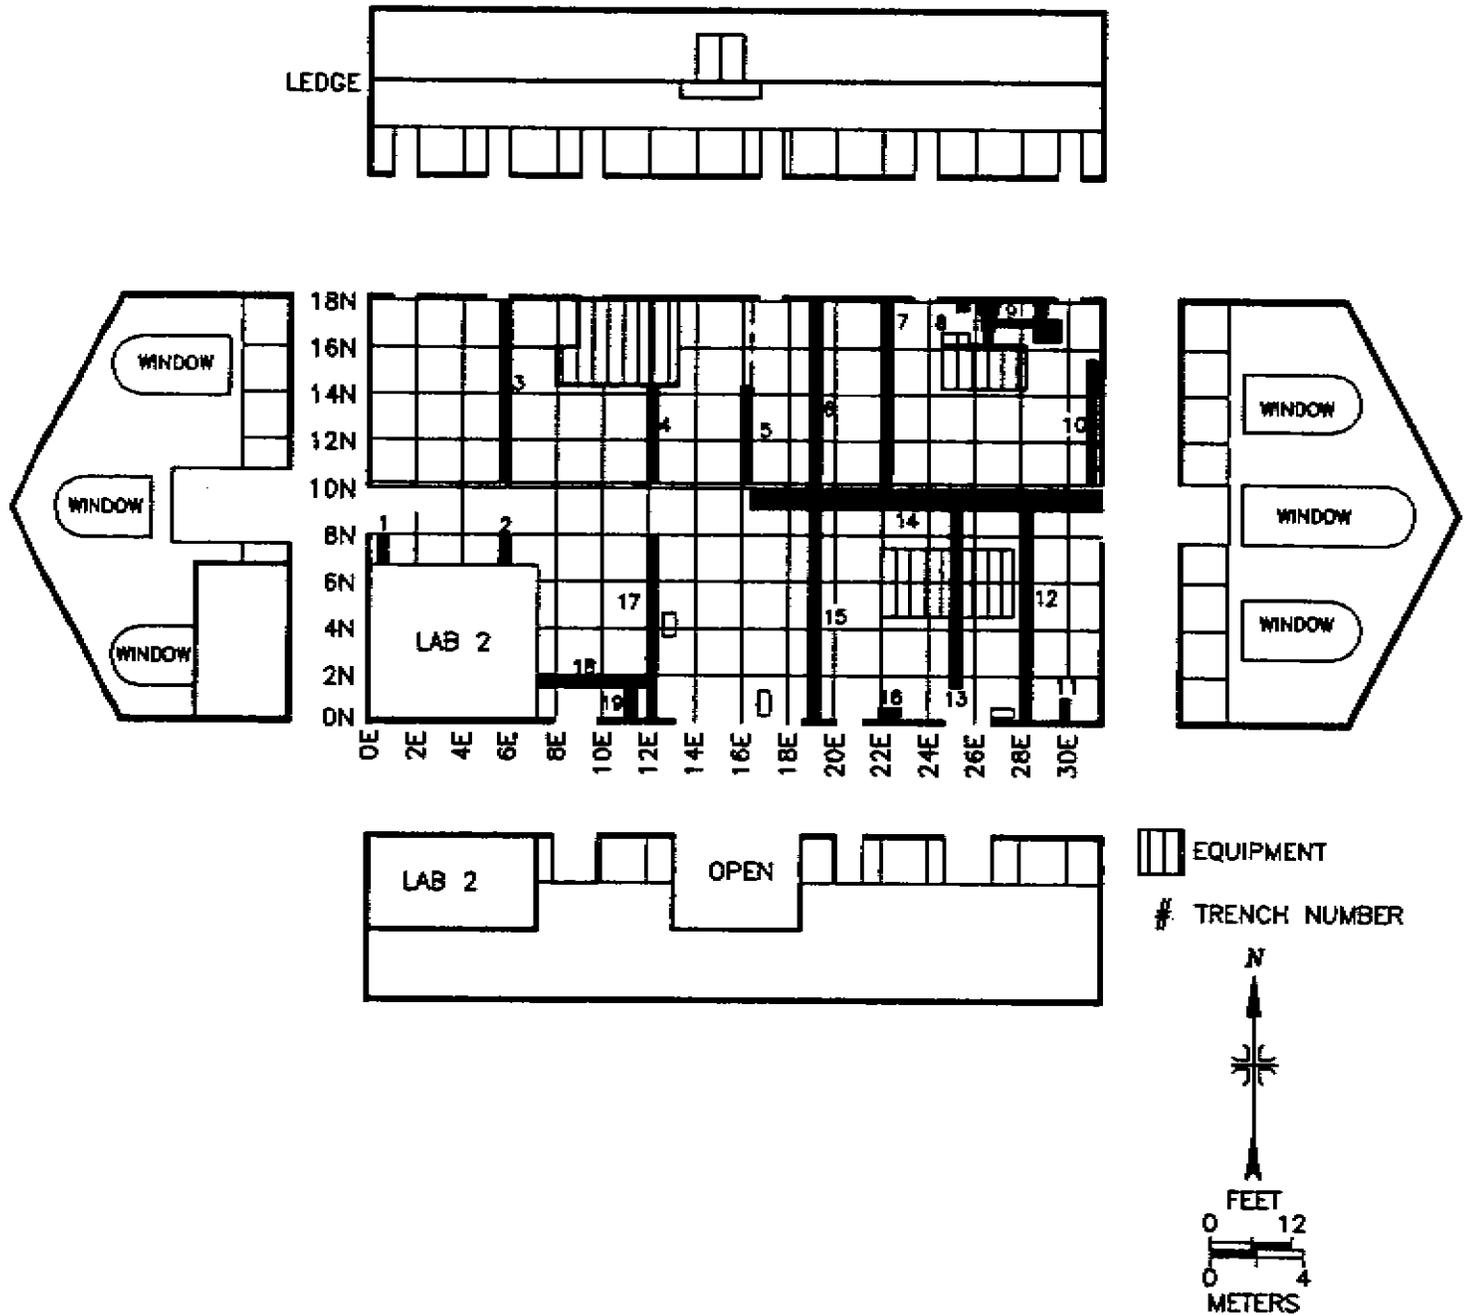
Building 23, Lab 1, Indicating Reference Grid and Trench Locations
